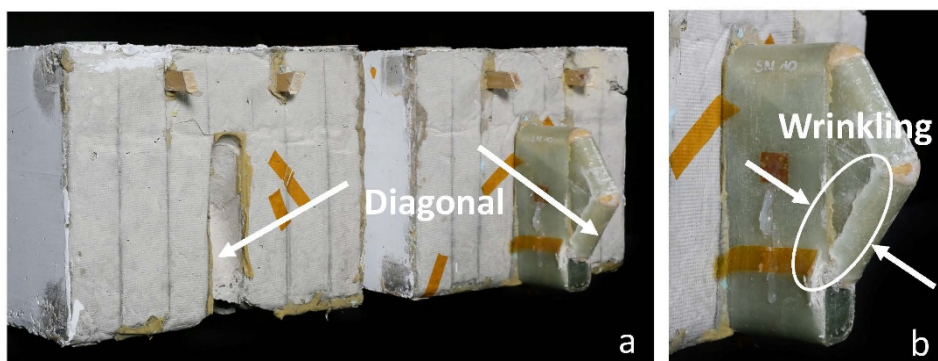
Failure mode of beam G400-1: a) undamaged concrete in interior (left) beam, b) wrinkling of GFRP hexagon diagonal.
